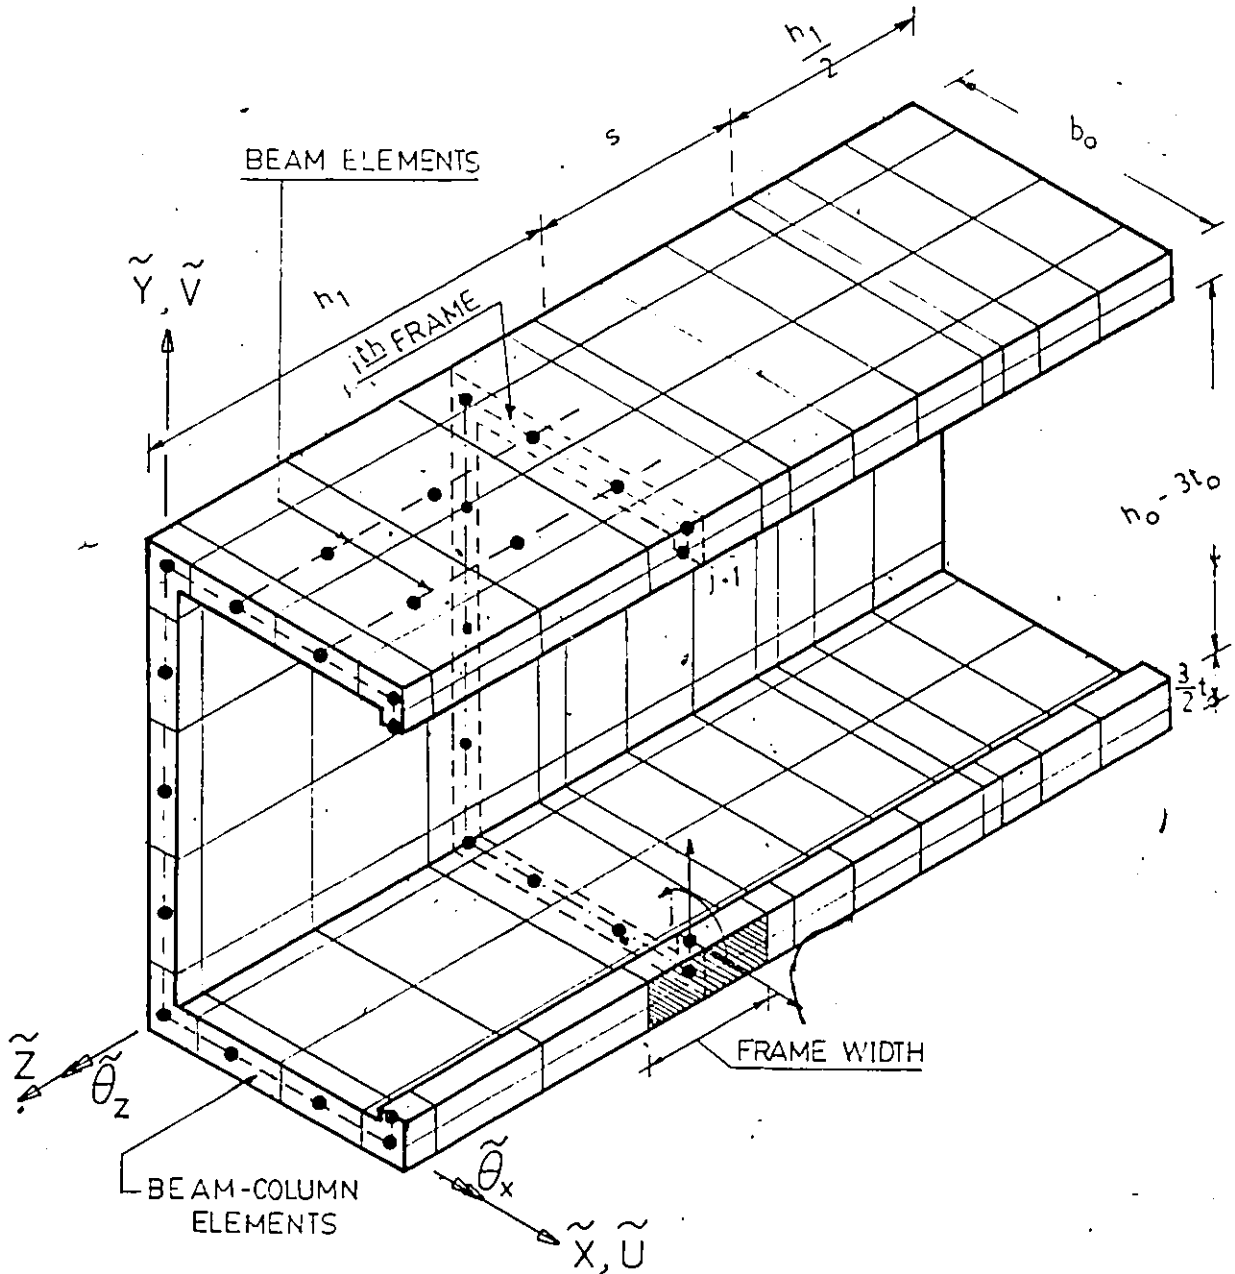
CHANNEL GRILLAGE OF BEAM ELEMENTS
